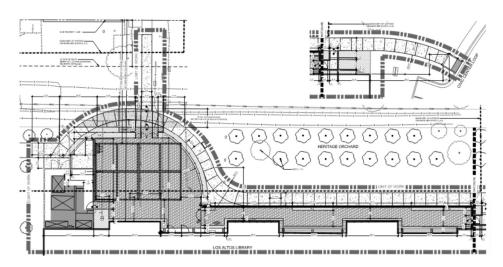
Site plan of the proposed work, revised drawings dated 12/10/2024 (SSA Landscape Architects).
